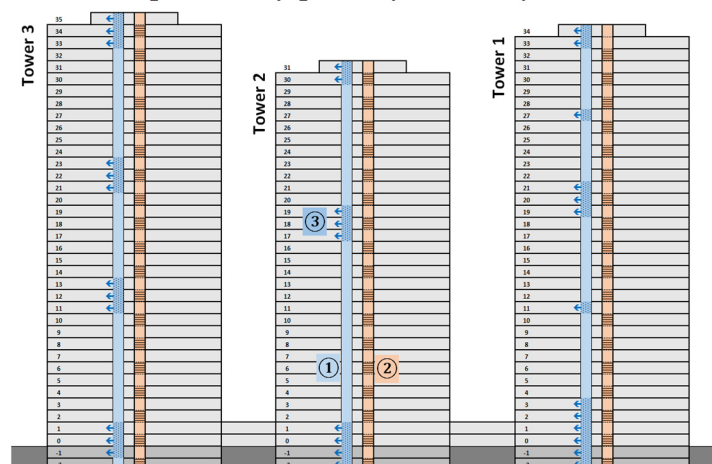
Airflow paths through the staircase ① and elevator shaft ②. ③ Open elevator doors
